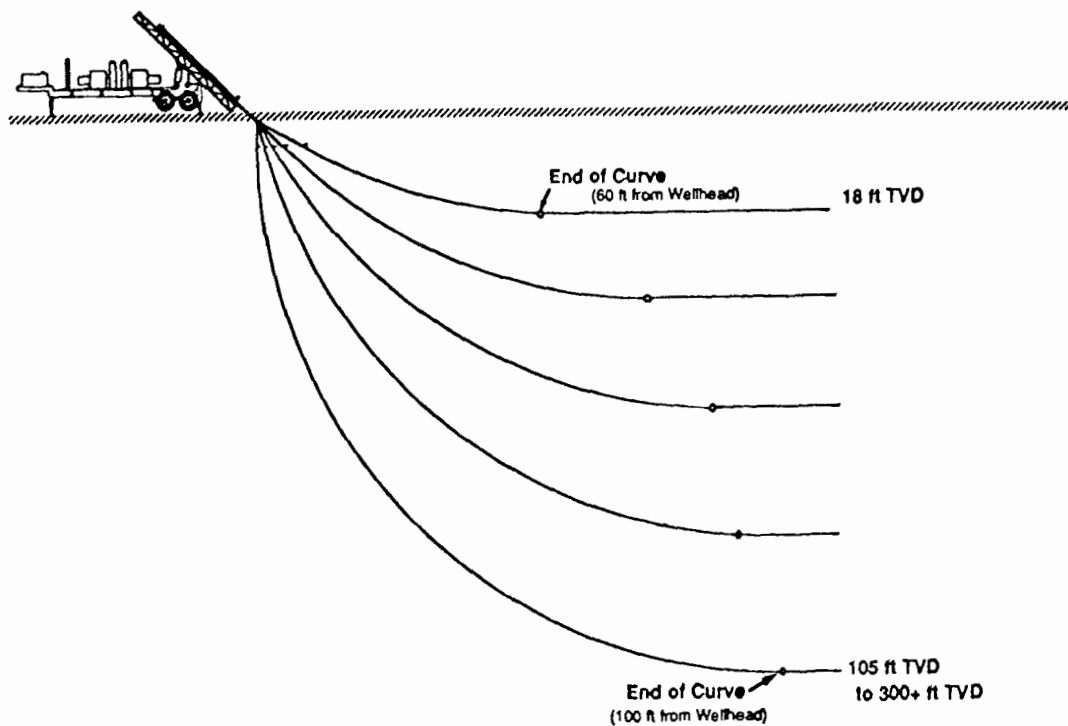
Depth Capability. Unit can place horizontal sections at any specified depth.
